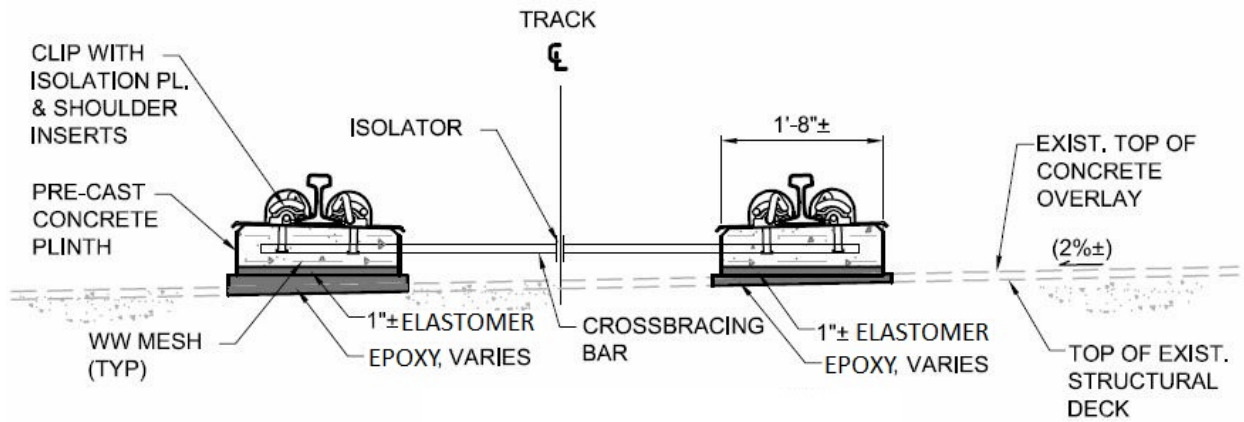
Conceptual Detail of a Plinth Attached to Concrete Deck by Elastomer-Epoxy System (Sound Transit 2013)
